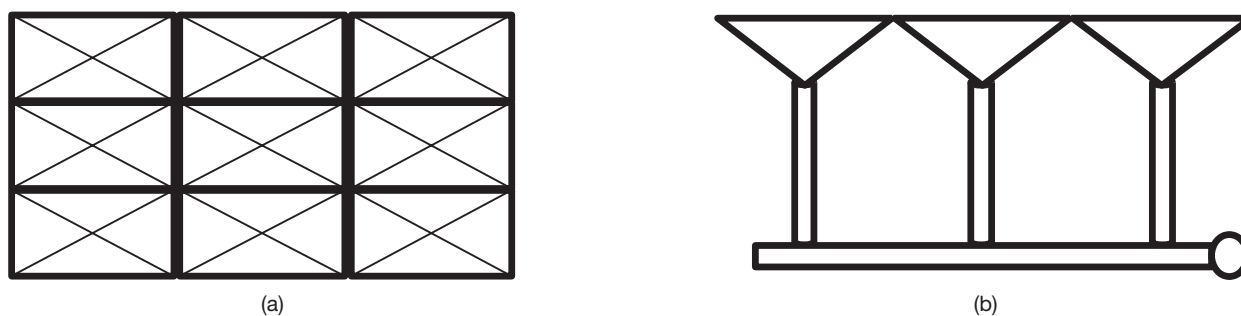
(a) and (b) Top view and the cross-sectional elevation of inverted umbrella structures in an open configuration.
